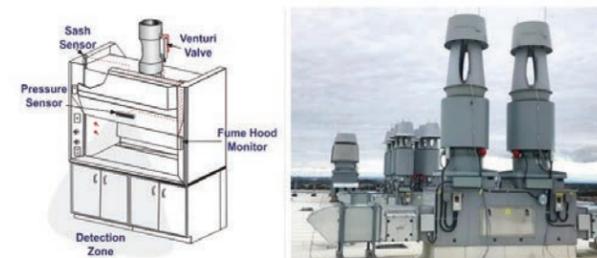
Fume Hood Room Layout (left), Rooftop Exhaust Fan (right)
